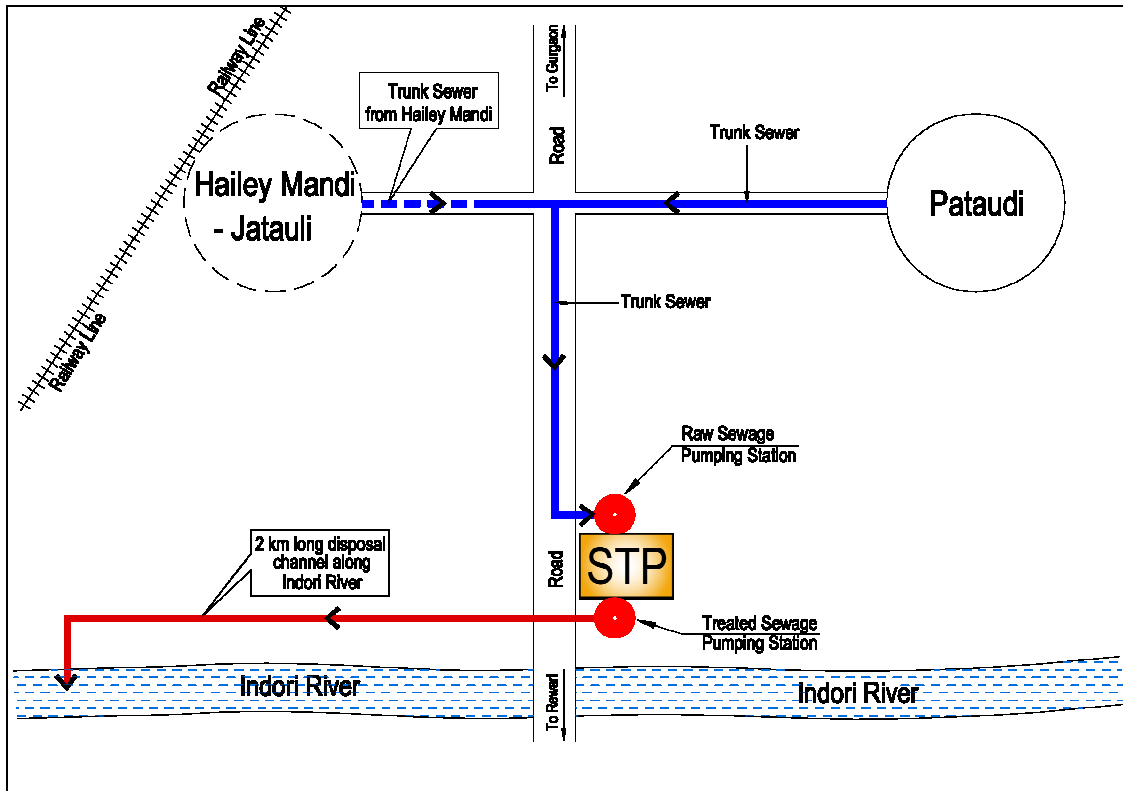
Layout Plan For Disposal Of Treated Sewage To Indori River
